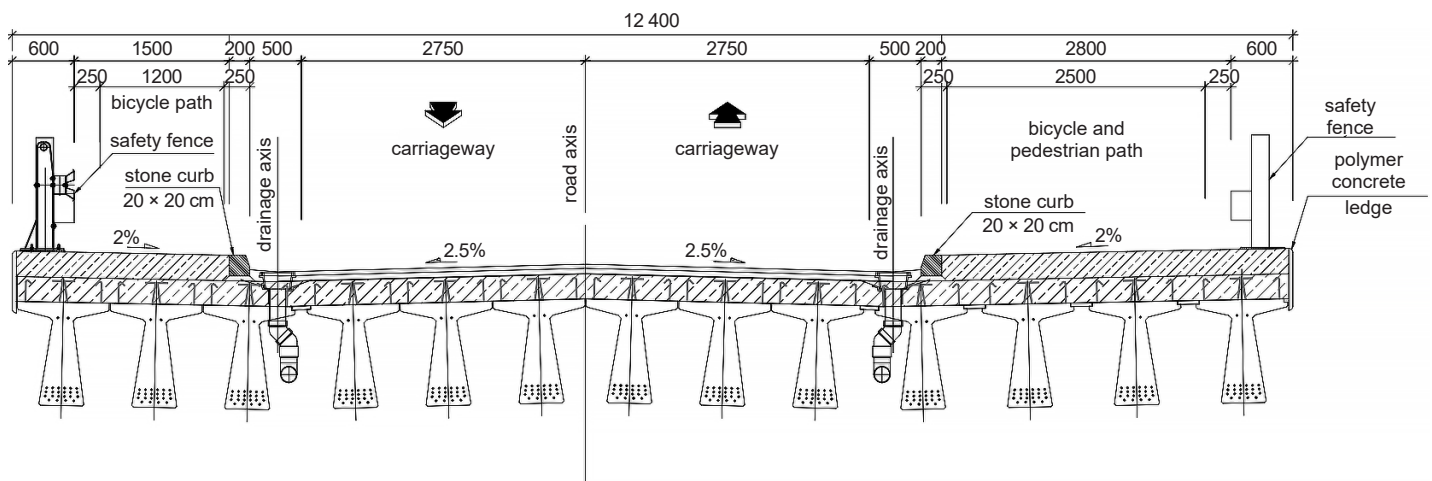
Cross-section of the load-bearing structure of the new bridge over the Ner River
